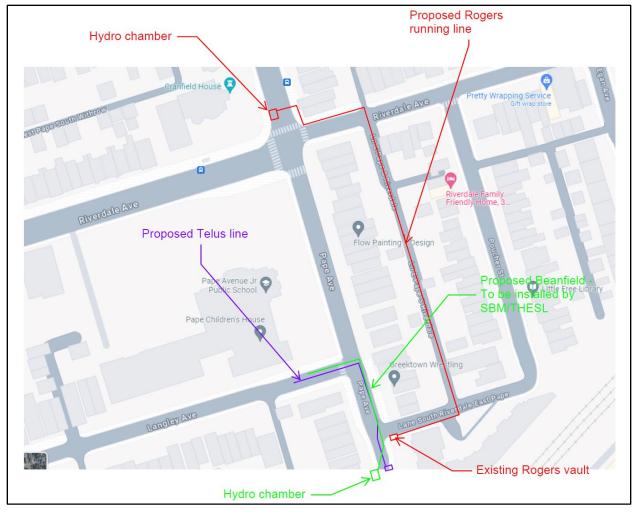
Pape and Riverdale Advanced Works – Dry Utility Location (Rogers, Beanfield and Telus)
